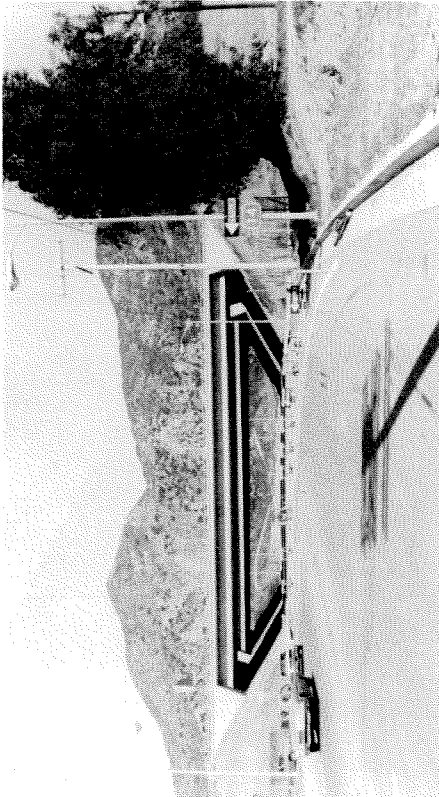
49 Yarnell Street undercrossing, Foothill freeway.
